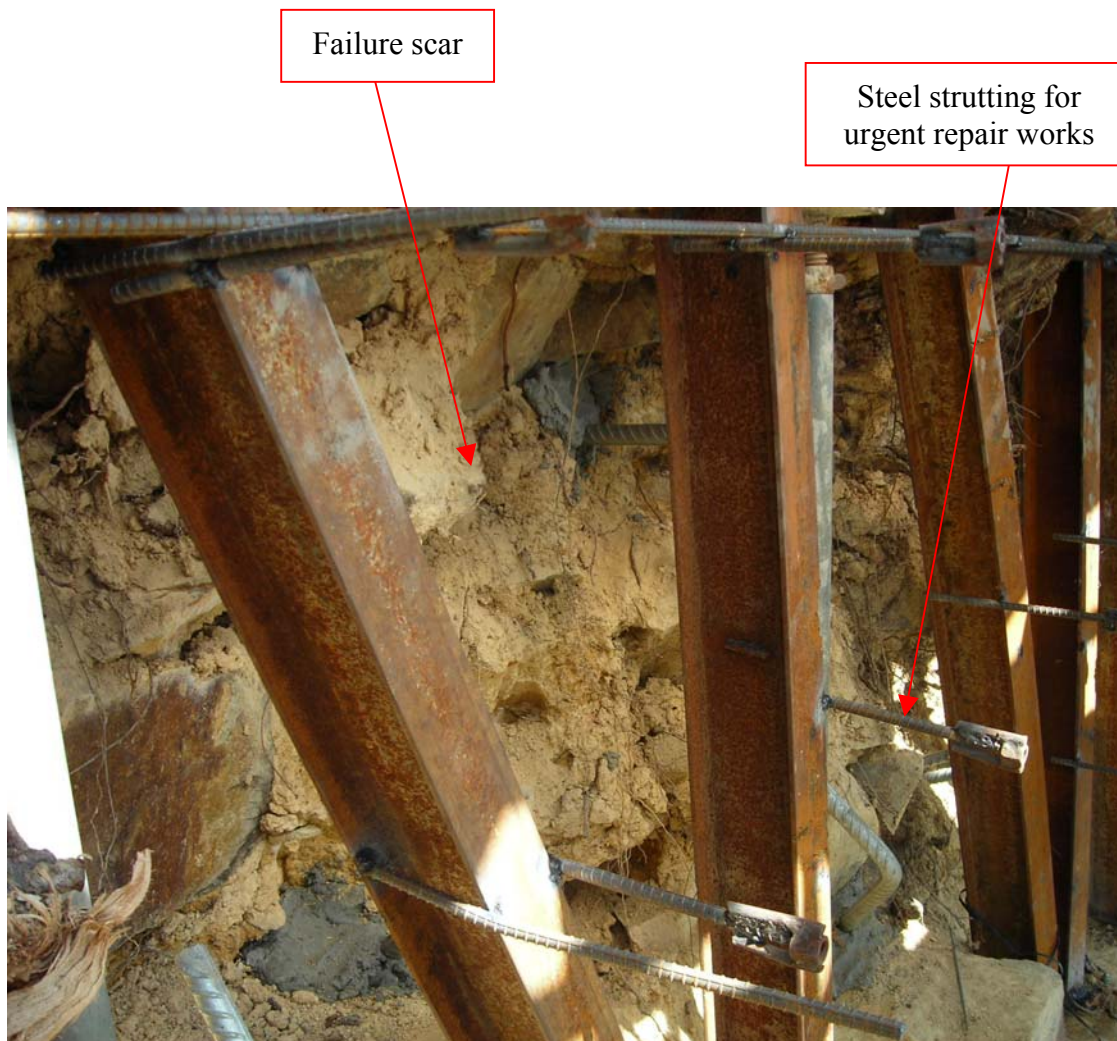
Close View of Failure Scar (Photograph taken on 30 August 2006)
